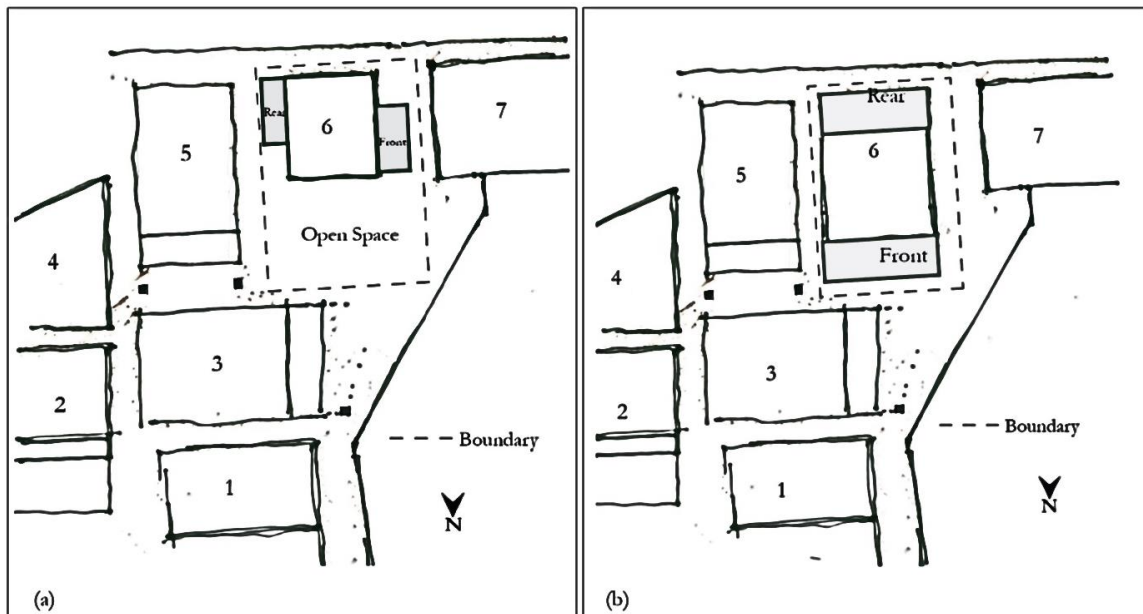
Building layouts showing building 6 before and after the newly constructed building (Fieldwork, 2022).
